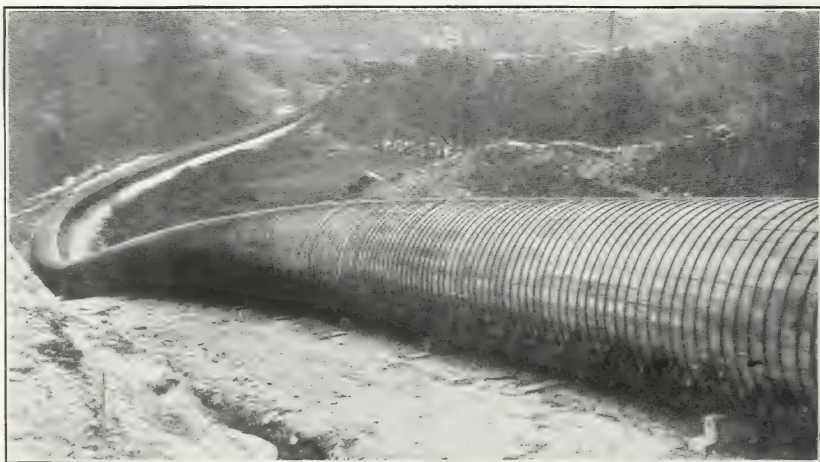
TRUNK LINE, MOHAWK HYDRO-ELECTRIC CO., NEW YORK (No. 50). TYPICAL ALIGNMENT AND PROFILE.
